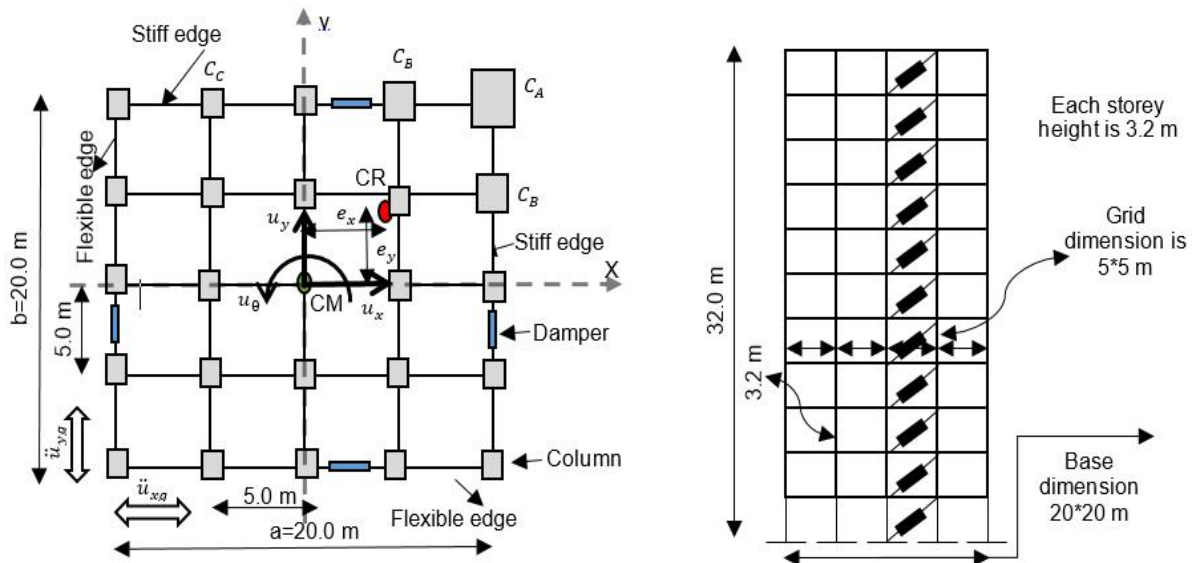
Typical floor plan and elevation of asymmetric building showing arrangements of dampers
